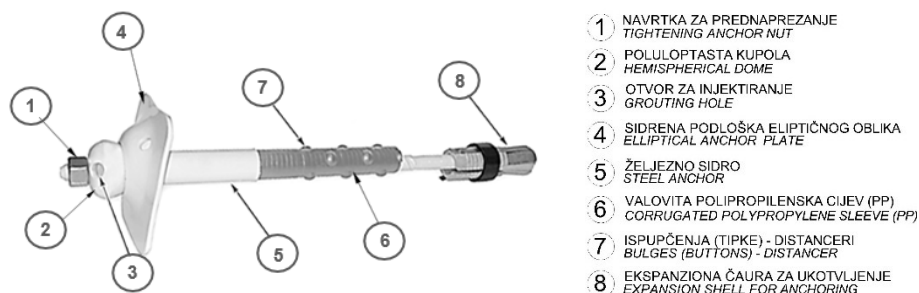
Illustration of the rock bolt with the combined mode of anchoring, point-anchoring, and friction-anchoring (fully bounded)
